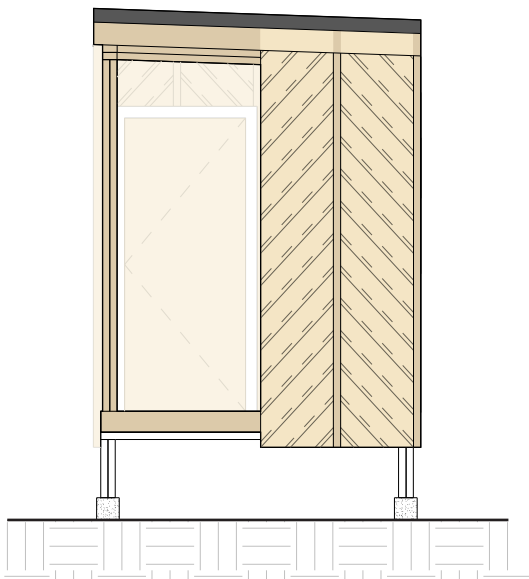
ELEVATION C-C PRIOR TO THE BUILT. SCALE 1:50
